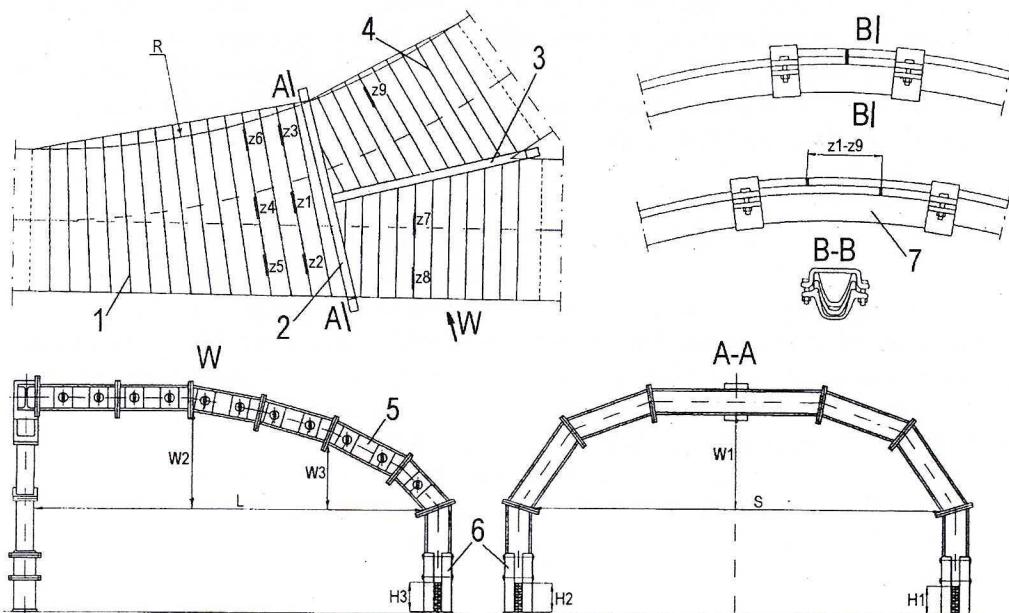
Skeleton support construction of junctions of "Łabędy" type
